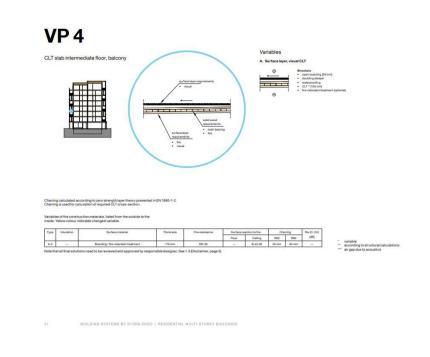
CLT slab intermediate floor, balcony, evacuation road on the facade (Stora Enso, 2016)
